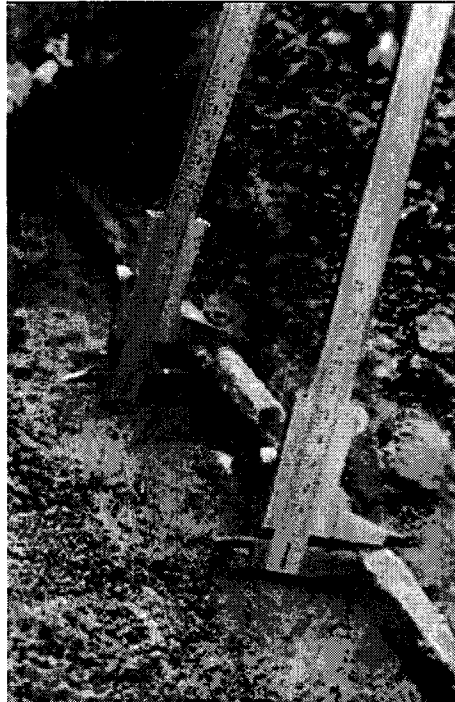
Corrosion of steel reinforcement in concrete bridge (Amleh and Mirza, 2004)
